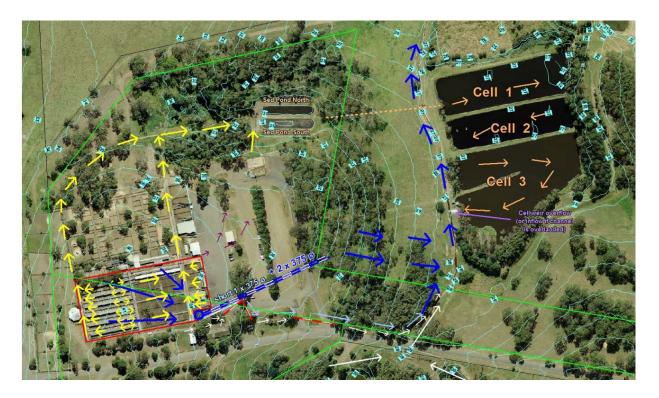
NRLX stormwater flow arrangement – Yellow arrows show existing flows, blue arrows are the new proposed arrangement.
